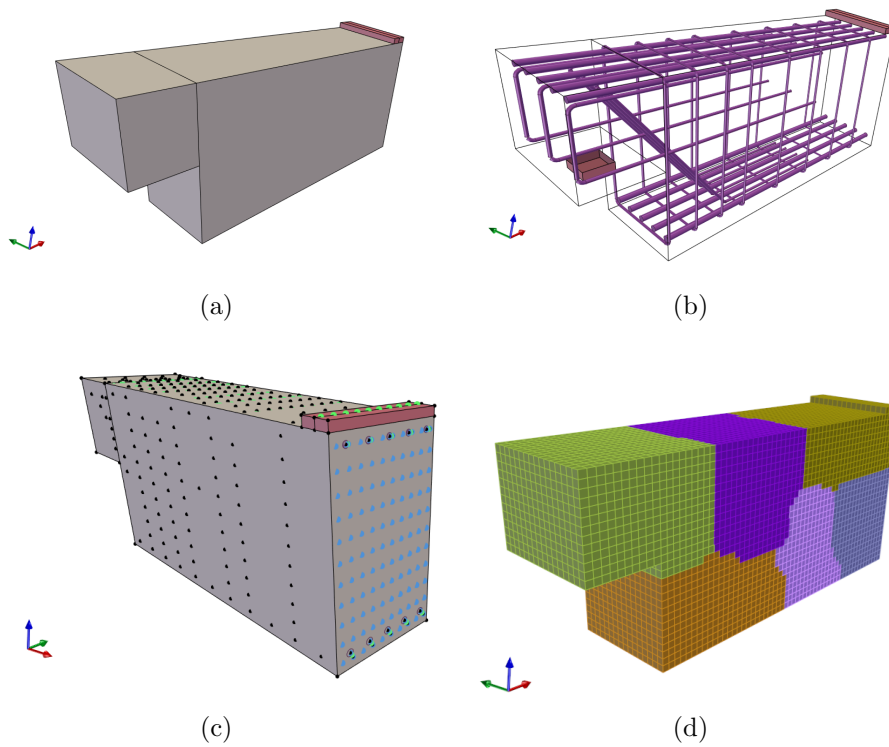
(a) 3-d model of the half joint and (b) view of the rebars arrangement; (c) details of the constraint; (d) mesh partition.
